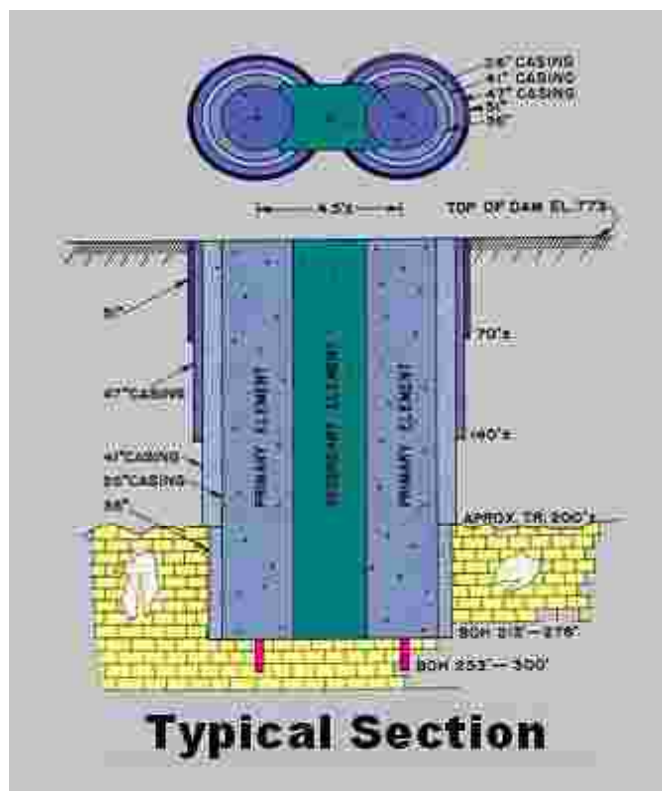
Plan and Section Showing Primary and Secondary Elements of Wall
